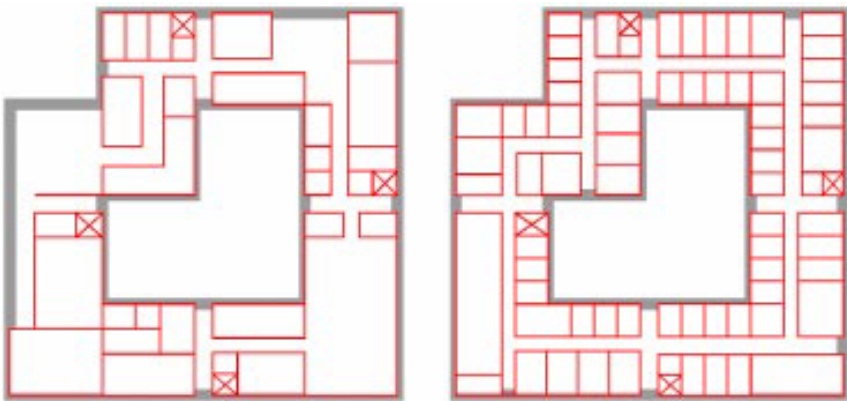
2D plan of the 'A' building at Fredrik Bajers Vej 7, Aalborg University. Left: ground floor; Right: 1st floor.
